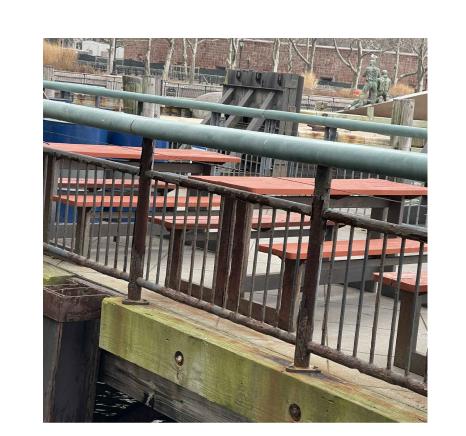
OPEN AREA #7 DETERIORATED HANDRAIL
